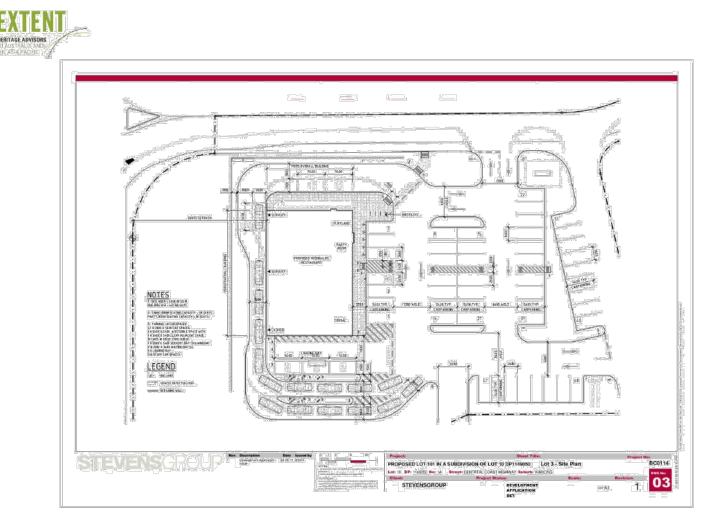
Design plan of the McDonald's Restaurant carpark showing traffic circulation (source: Stevens Group, Project No. BC0114, Drawing No. 03).
